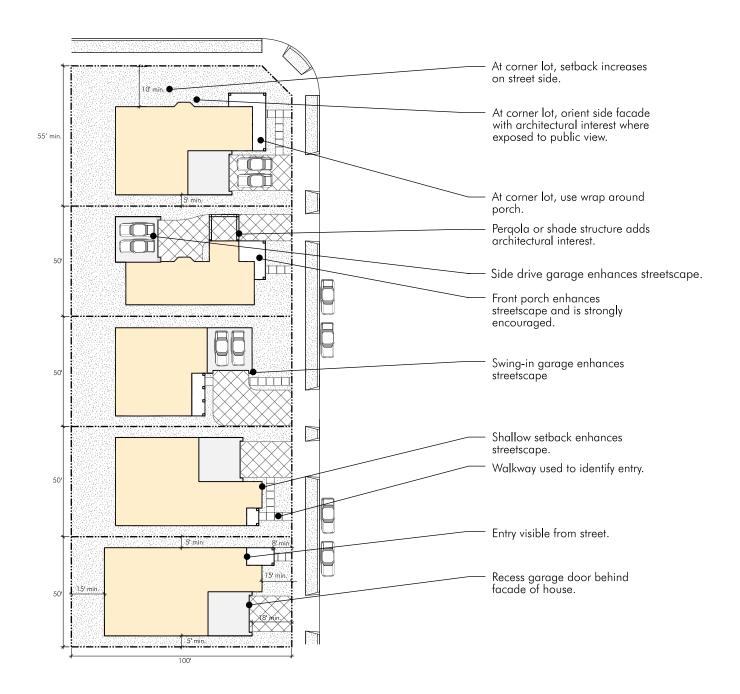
Typical 5,000 Square Foot Lot Layout
